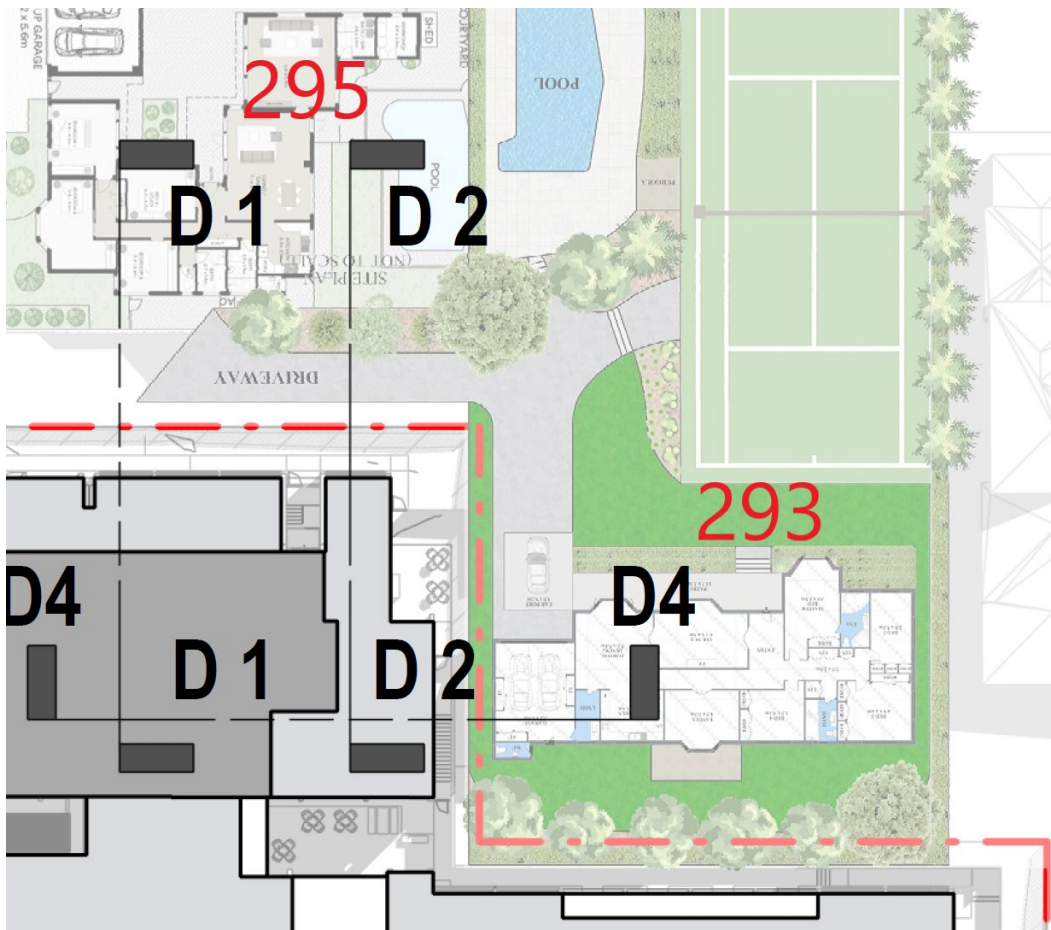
| Image showing floor plans of 293 and 295 Mona Vale Road
